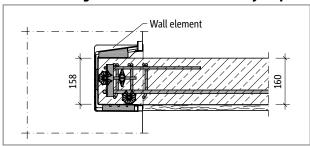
Schöck Tronsole  $^{\circ}$  type Z: Wall element as stay-in-place formwork
